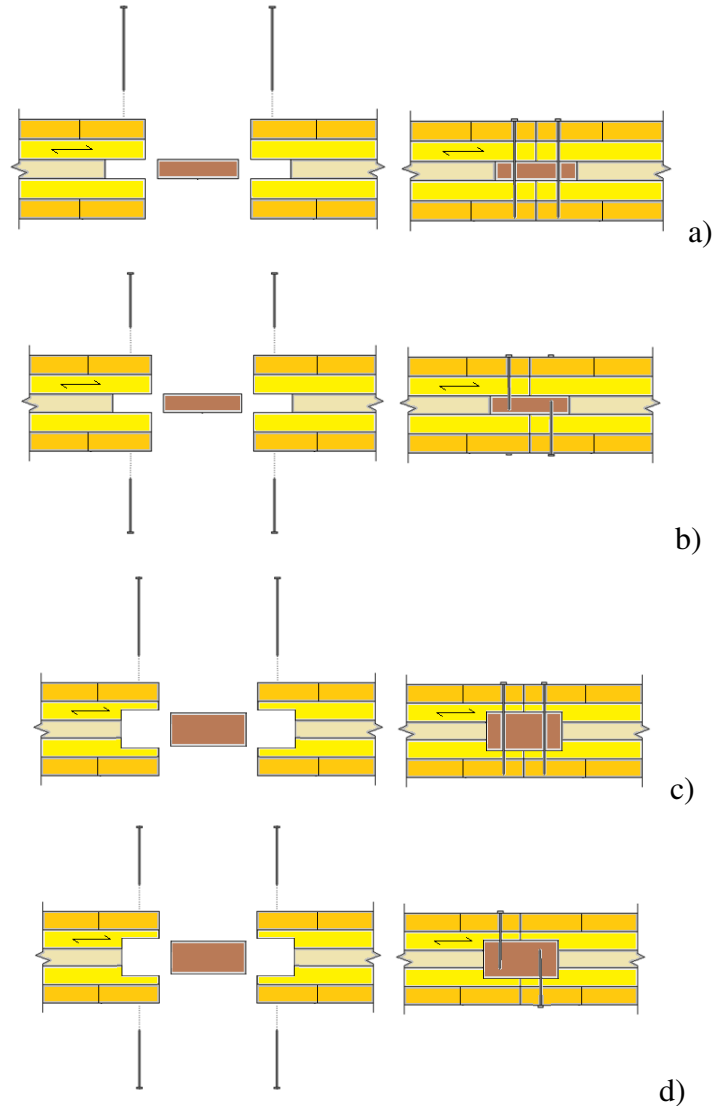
Single internal spline solutions for aligned wall-to-wall or lateral floor-to-floor connections: a) spline with a thickness equal to the corresponding layer's one and full-length fasteners; b) same solution with alternate single-shear planes; c) spline with larger thickness and full-length fasteners; d) same solution with alternate single-shear planes.
